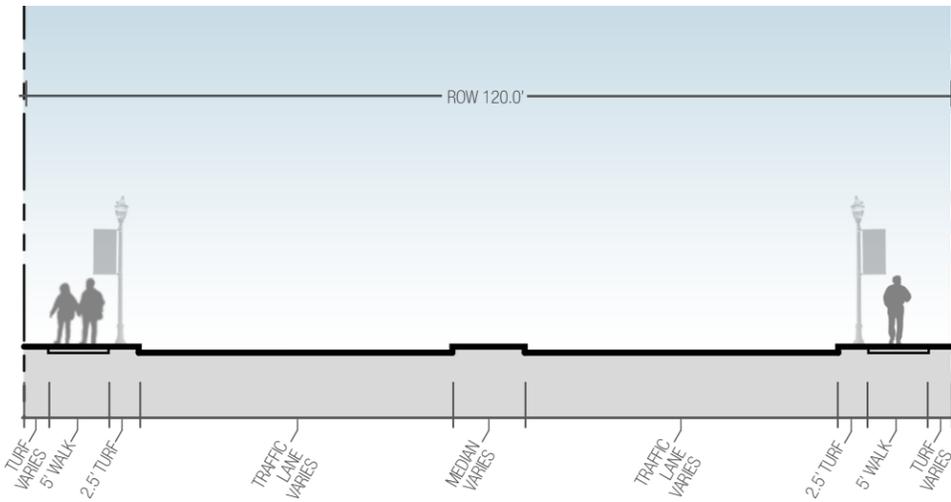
PROPOSED ANTIOCH ROAD 120.0' ROW SECTION B-B'
